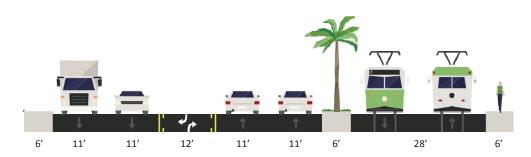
Channelside Drive Typical Cross-Section, between Washington Street and Kennedy Blvd
